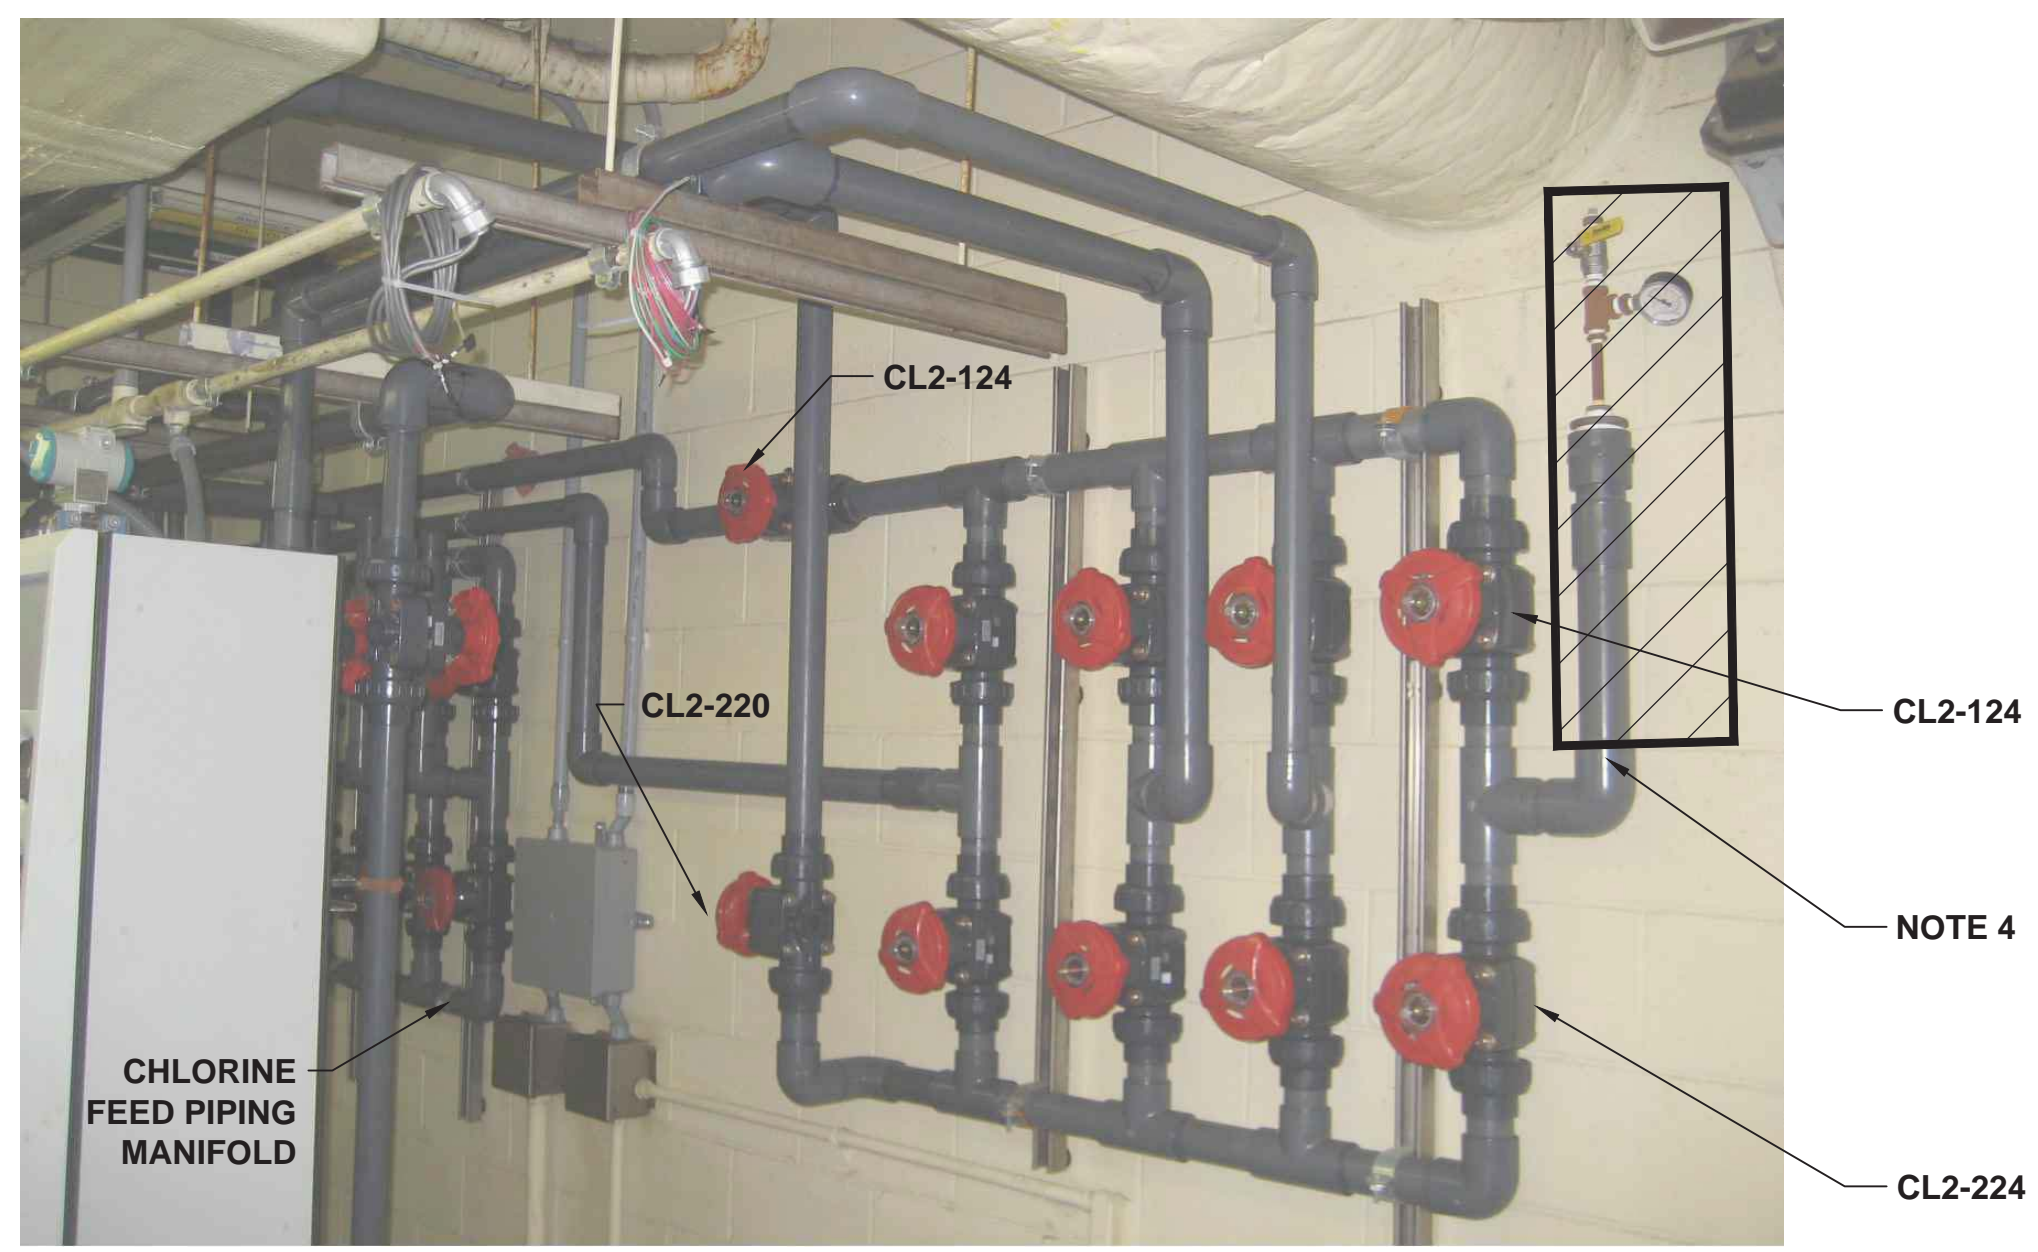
CHLORINE GAS SUPPLY PIPING
